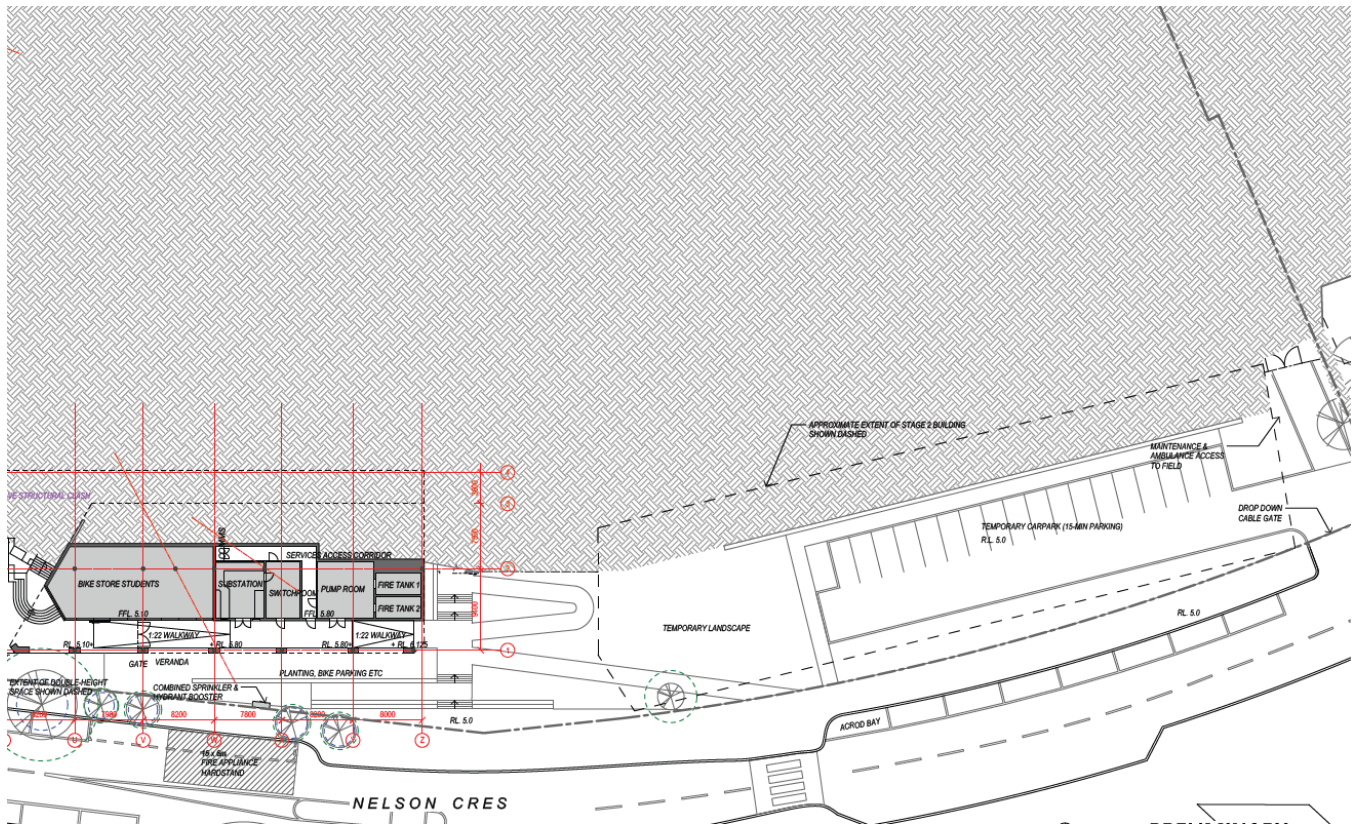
Parking area – Nelson Crescent (source: EIW/ARM)
